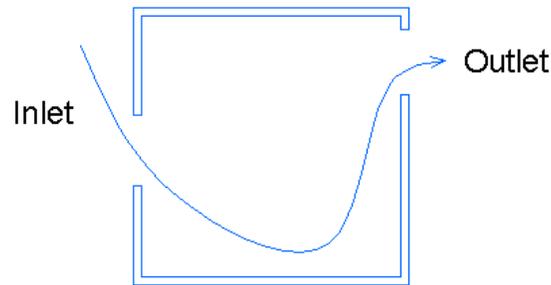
Floor Plan Showing Opposite Openings for Angular Wind
